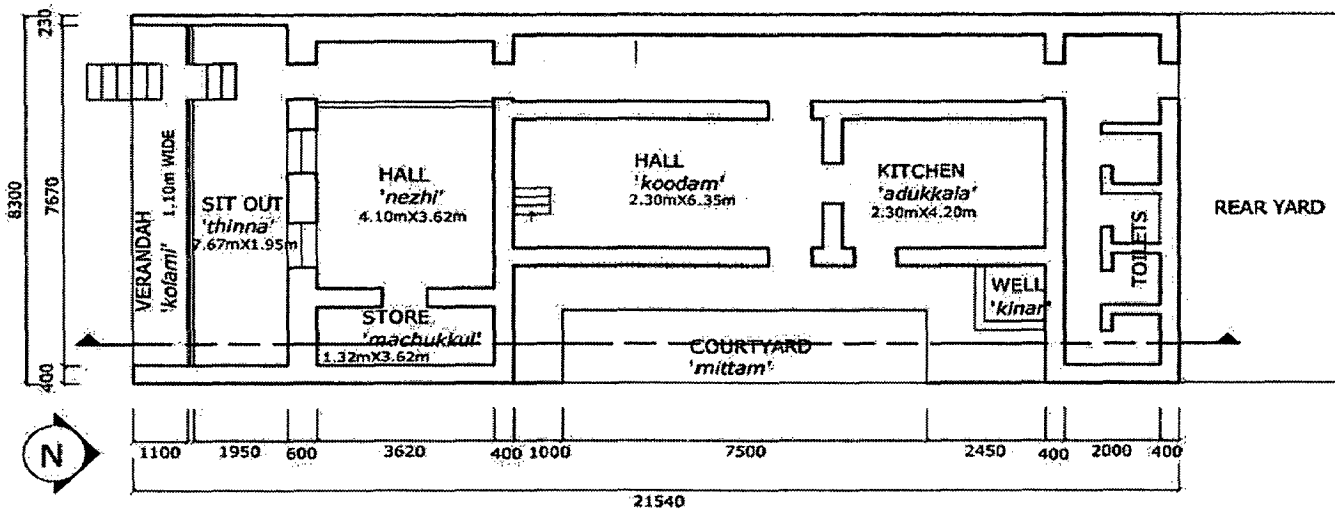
Ground floor plan of residence 2, in Kizhakkencherry Agraharam
